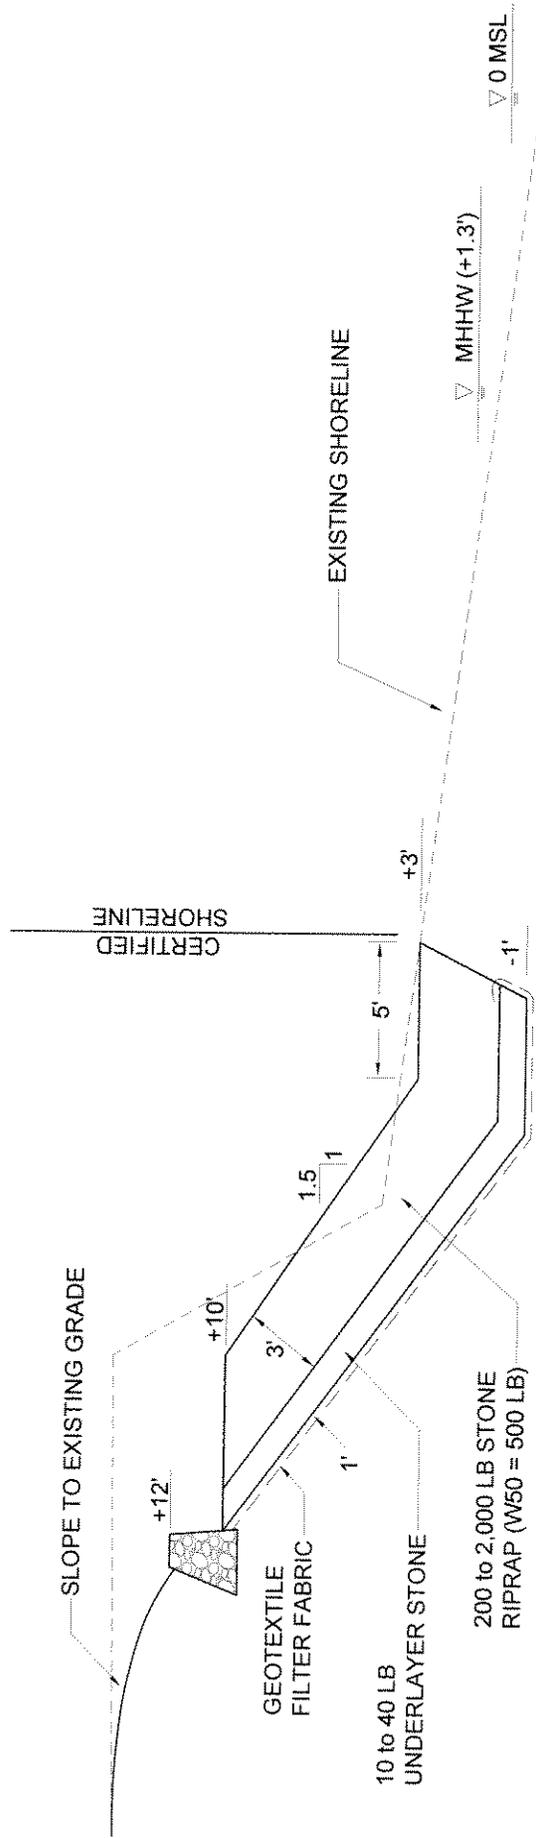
SHORE PROTECTION REVETMENT TYPICAL SECTION
